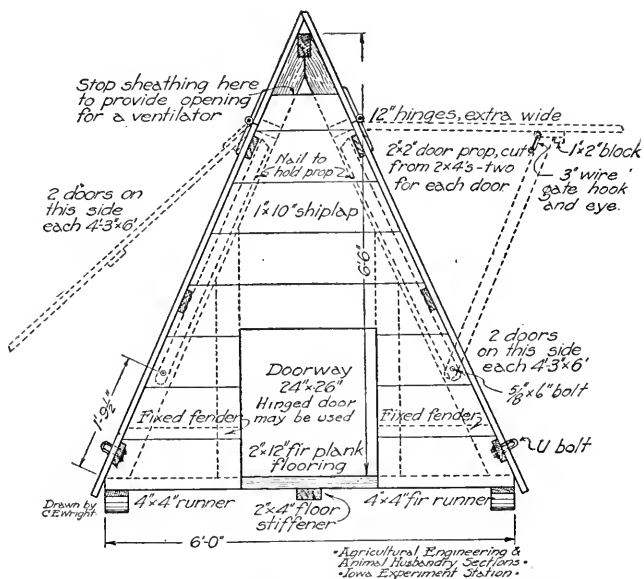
"A" House (Doors Hinged at Top). Front end elevation. Make doorway higher for mature swine.
